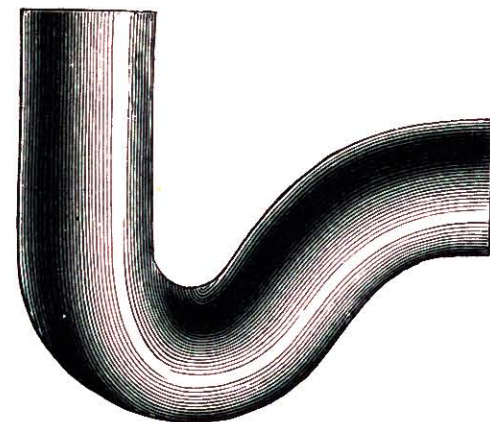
Cast-lead P-trap, with too easy Outgo.
